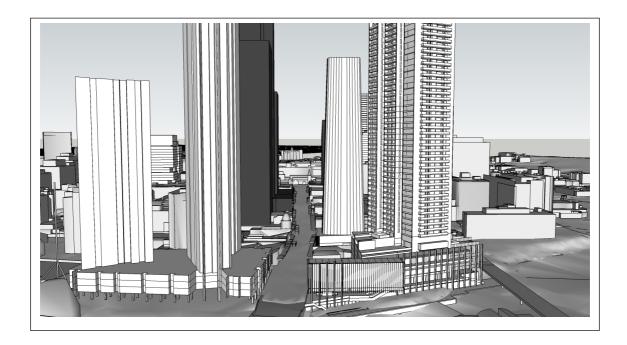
18m podium tower setback looking south towards St Johns Church
